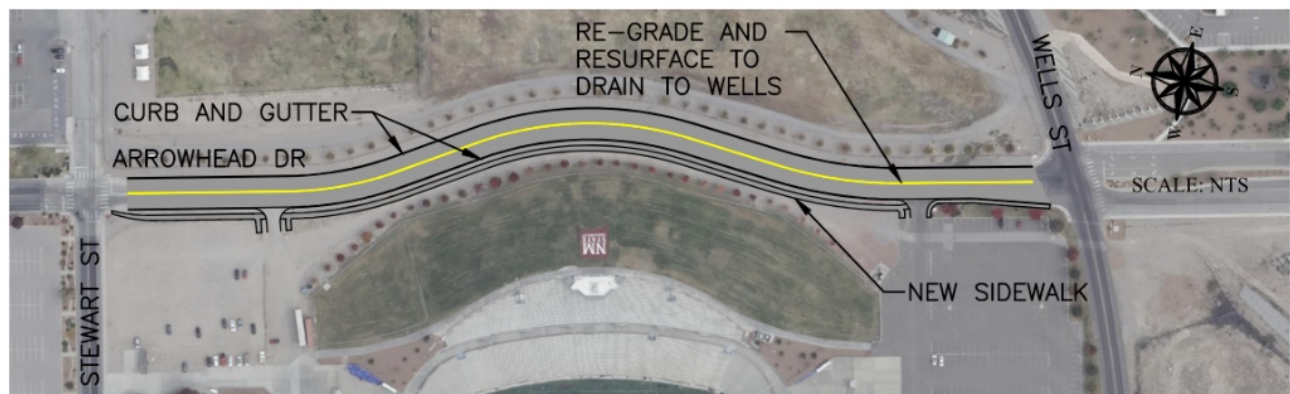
ARROWHEAD DR CURB AND GUTTER -PLAN
